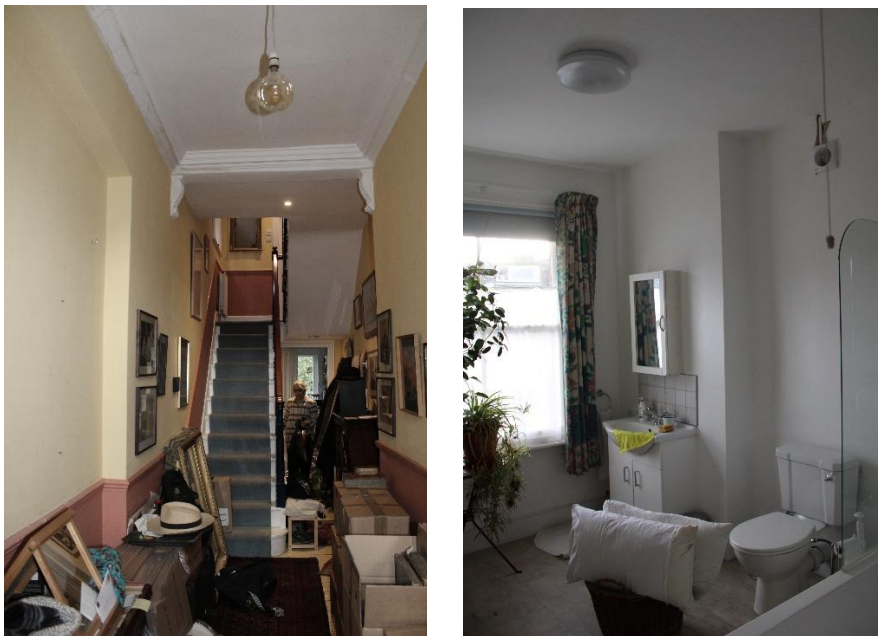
Ground Floor Entrance Hall and Second Floor Bathroom
